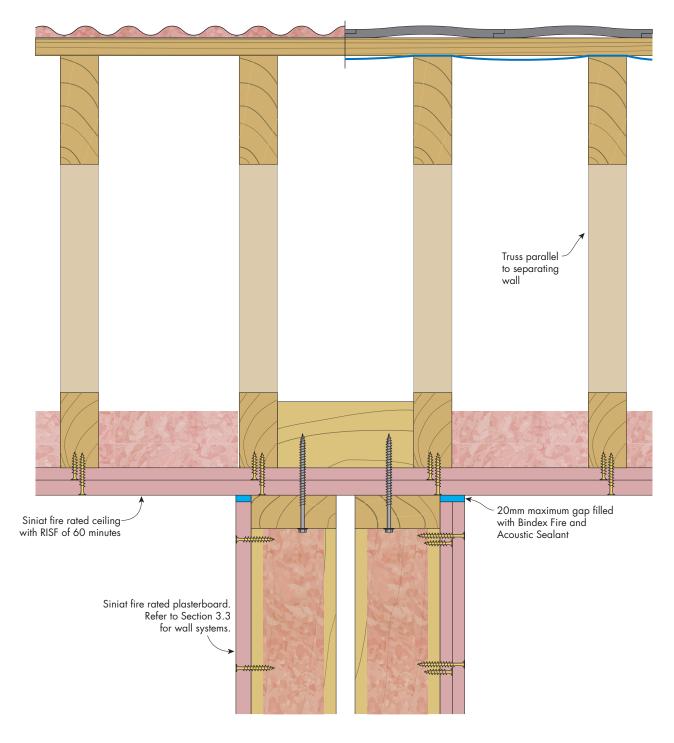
Separating Wall to Siniat Fire Rated Ceiling Section
